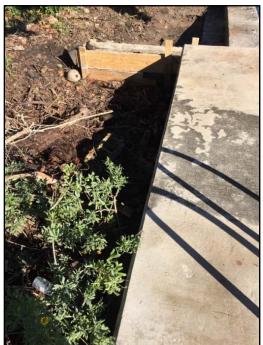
View of the North End of the Seawall Cap at NE 1st Court.
